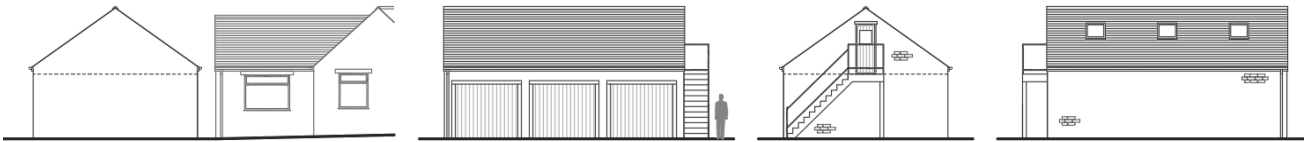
PROPOSED DETACHED GARAGE ELEVATIONS
